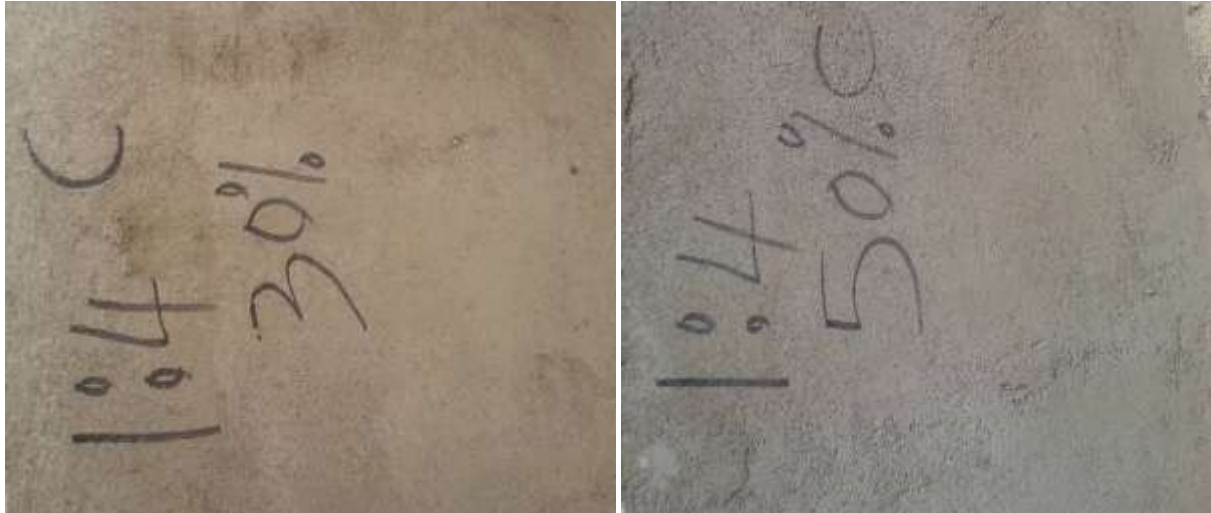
Showing walls plastered with bitter cassava flour at 30% and 50% cement replacement
